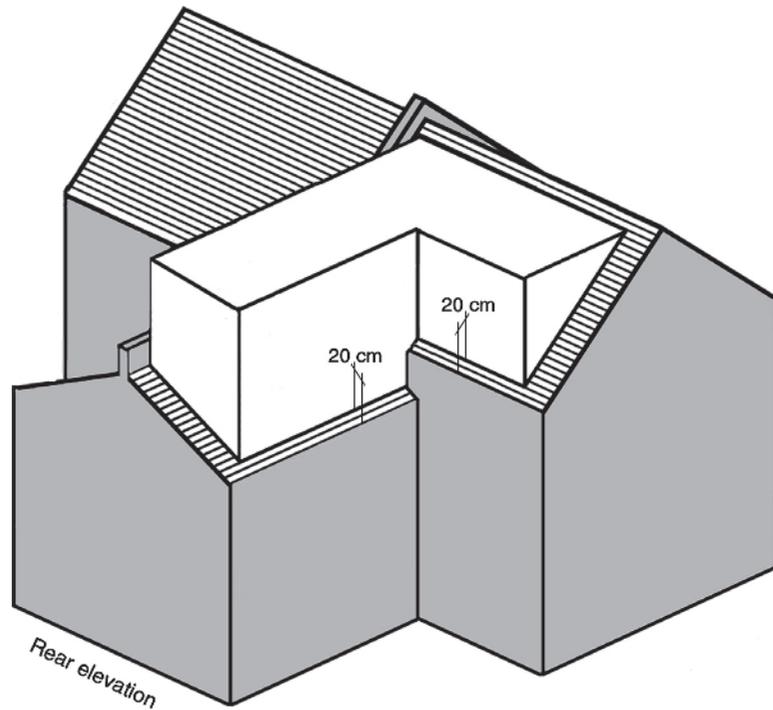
L-shaped loft conversion. Typical relationships between conversion, main roof slope, back addition roof slope and eaves.
